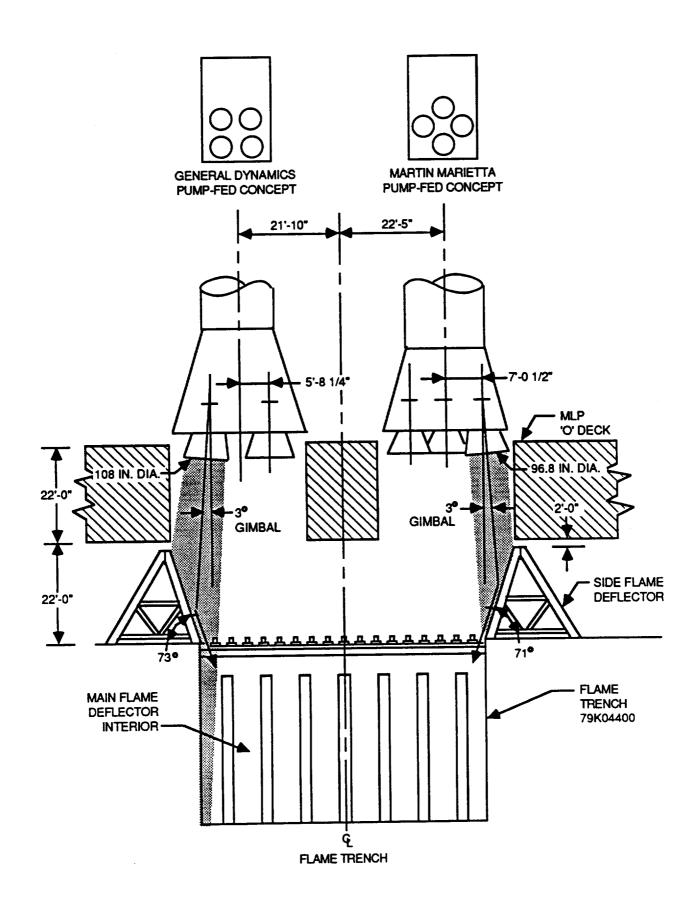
Pad Flame Deflectors (South Elevation).
